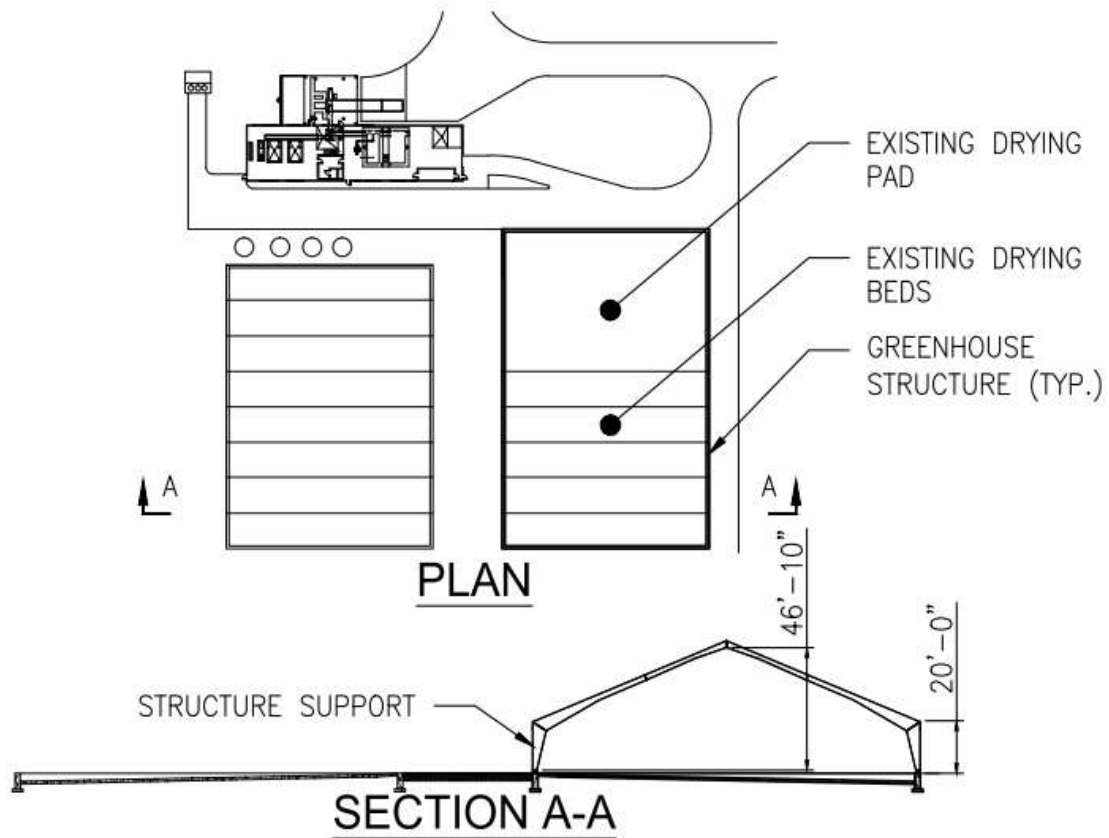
Sketch of potential enhanced non-mechanical dewatering bed layout at E.M. Johnson WTP
